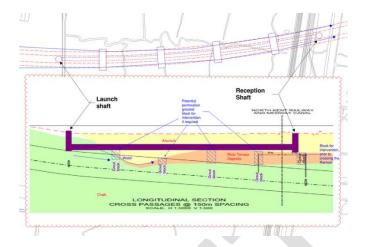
Cross section showing the grouting tunnel and grout blocks.
